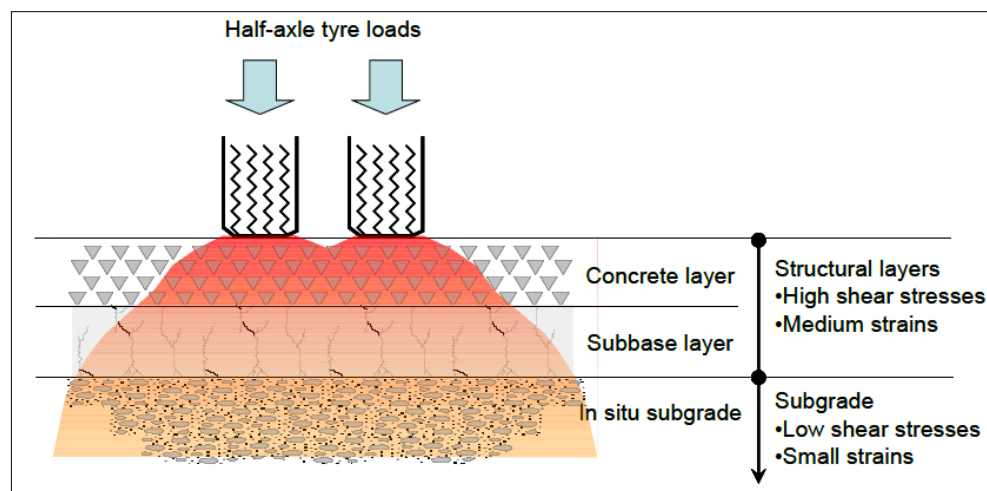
Stress distribution in a typical South African rigid pavement (SAPEM, 2013d).
